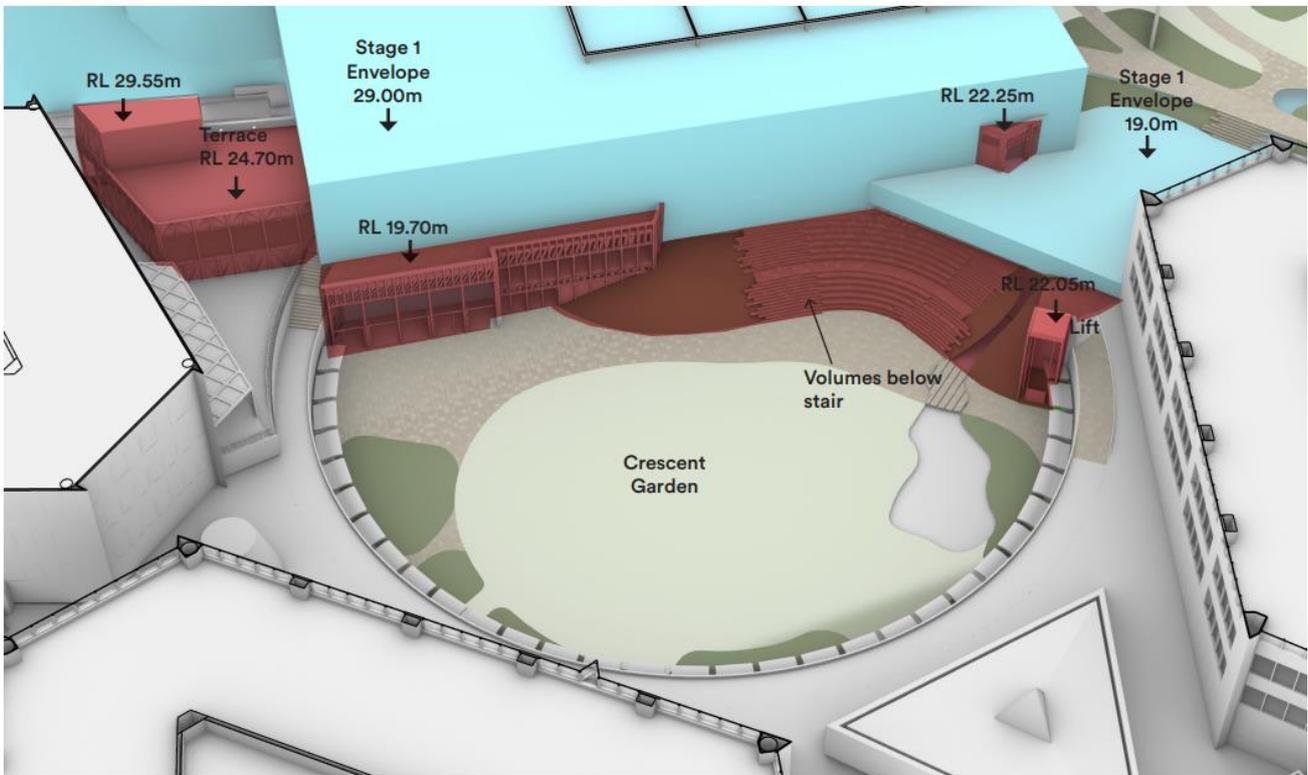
Detailed elements of the Crescent Garden Interface (proposed as part of the concurrent Stage 2 application) that require modifications to the approved envelope
